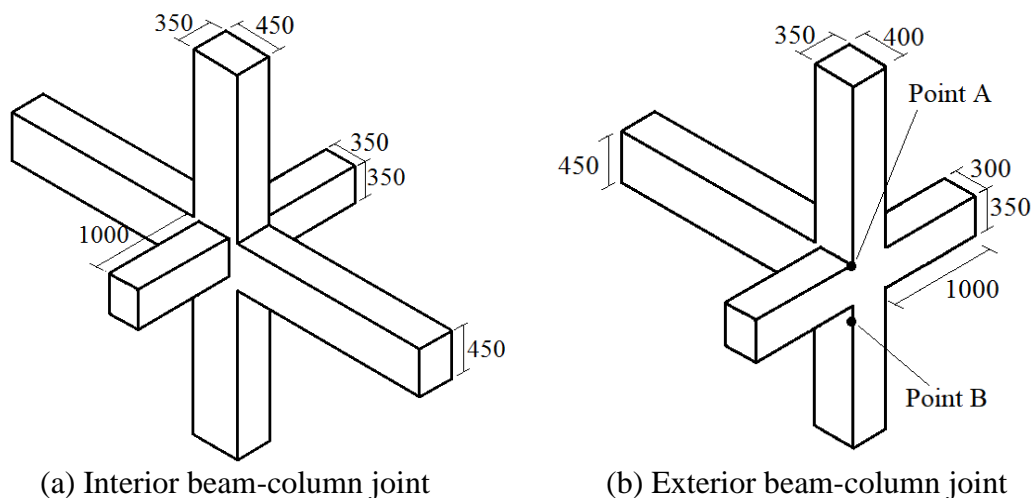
Dimensions of test specimens (dimensions in mm)
